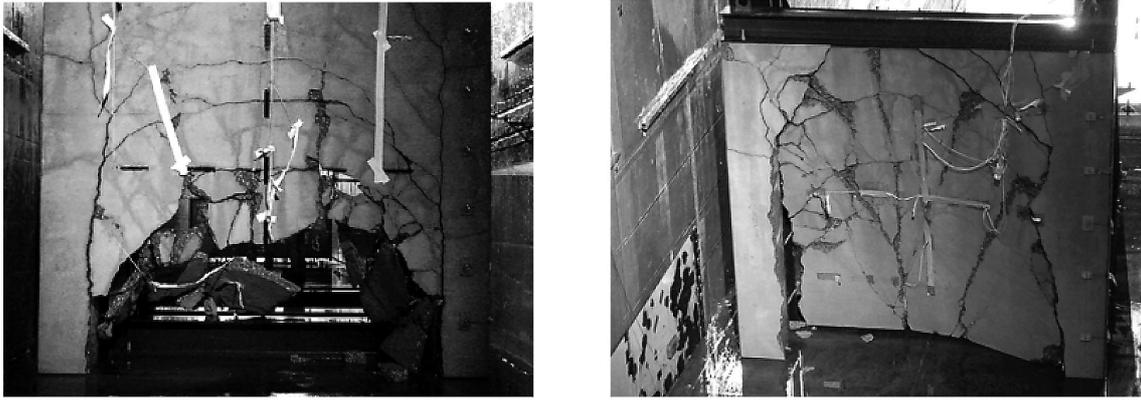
Failure of concrete wall with 6 cm (left) and 10 cm (right) thickness.
